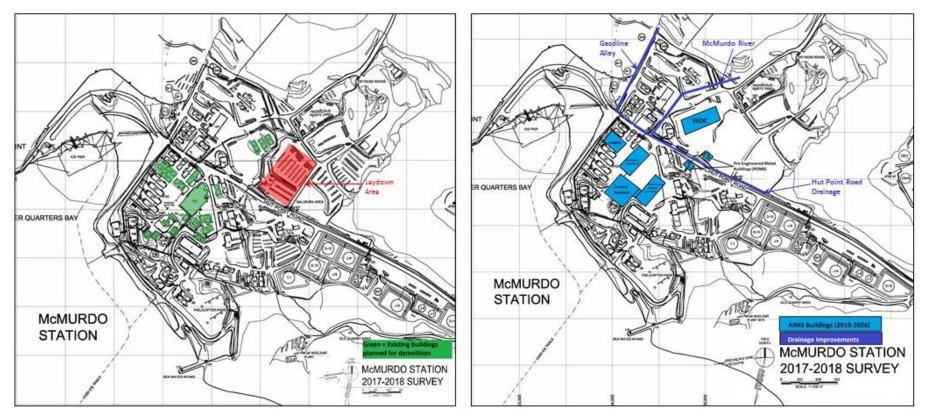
McMurdo Station Current Layout and Planned Demolitions
